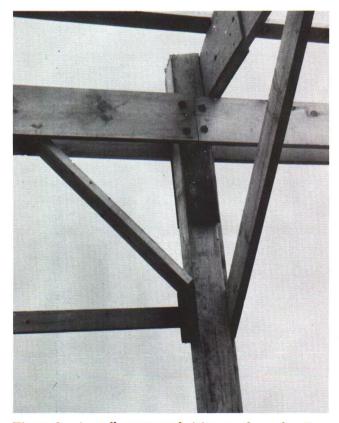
A well-constructed joint at the pole. Four bolts have been substituted for about one-half of the nails; wind braces in two directions.
